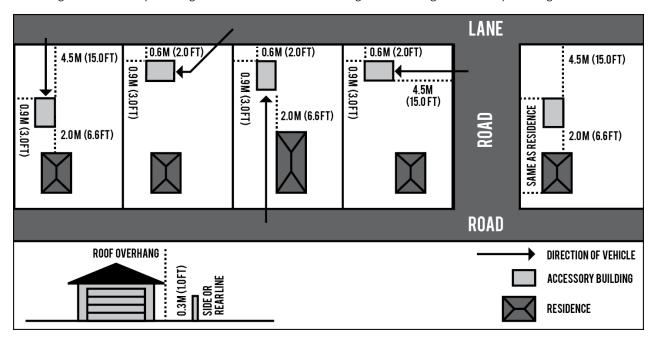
SITING OF ACCESSORY BUILDINGS
